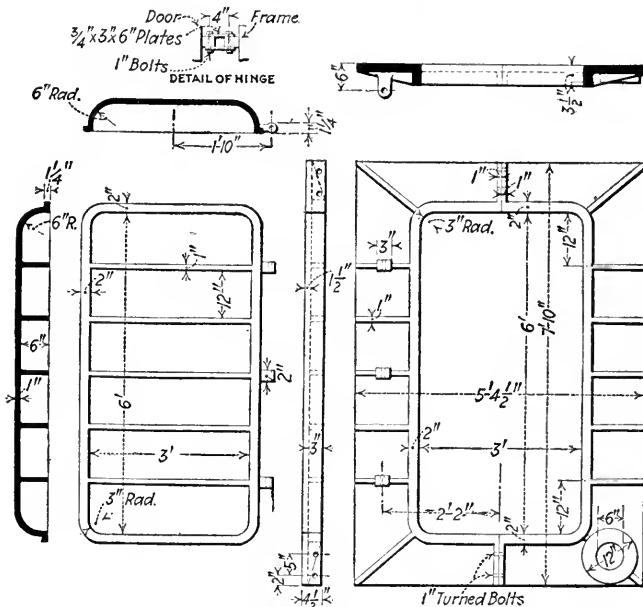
DOOR AND FRAME TO CONTROL UNDERGROUND WATER.
